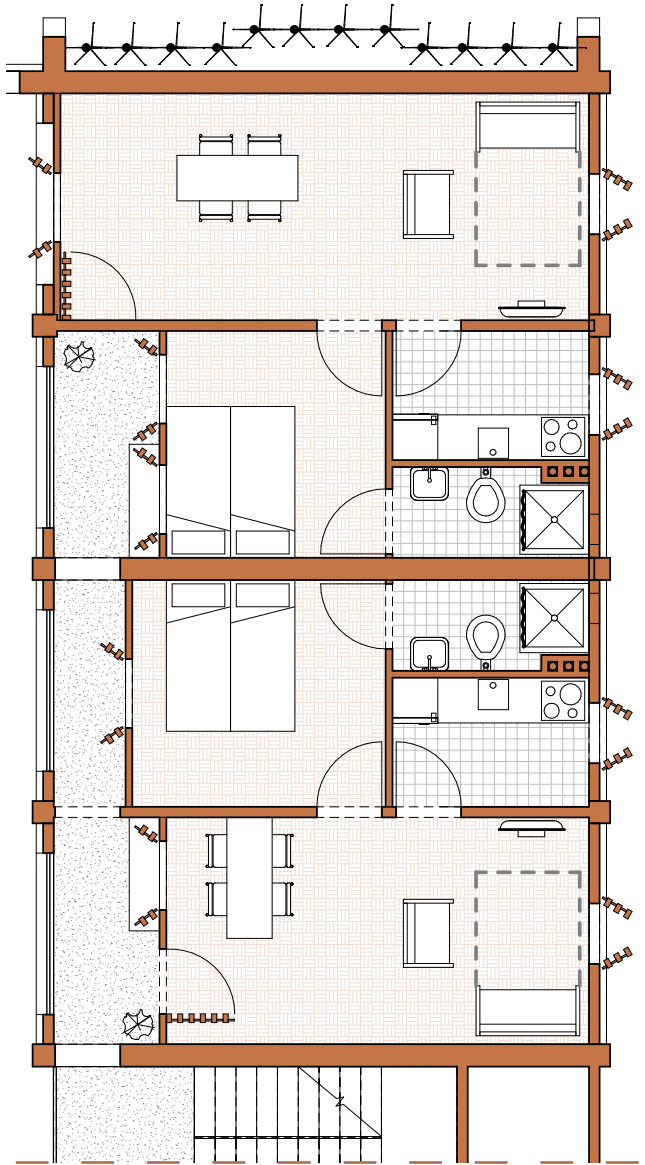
Ventilation Concept in Dwelling (1-Bedroom) [Scale 1:100]
